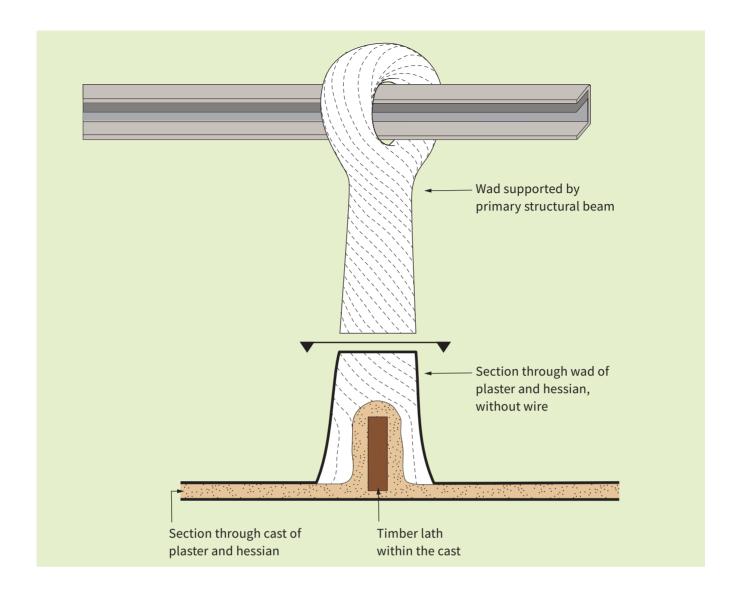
Section though a wad of plaster and hessian, without wire reinforcement. The adhesion between the cast and the wad is only by means of plaster-uponplaster contact, with the fresh plaster of the wad fixed to the hardened plaster of the cast.
